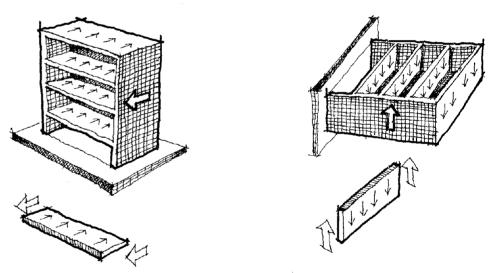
shows a simple building with shear walls at its ends. Ground motion enters the building and creates inertial forces which move the floor diaphragms. This movement is resisted by the shear walls, and the forces are transmitted back down to the foundation.
